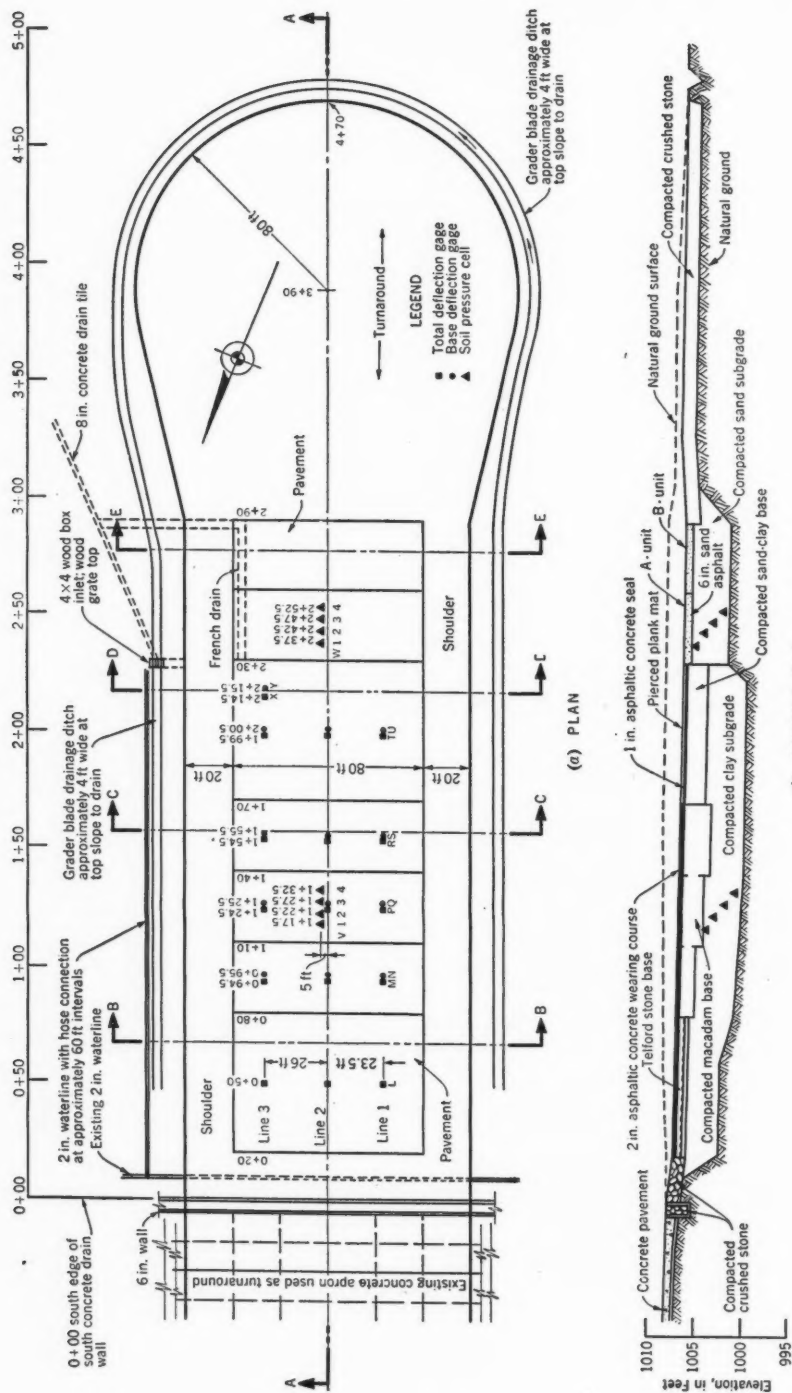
FINAL PLAN AND PROFILE, TEST SECTION, MARIETTA, GA.
